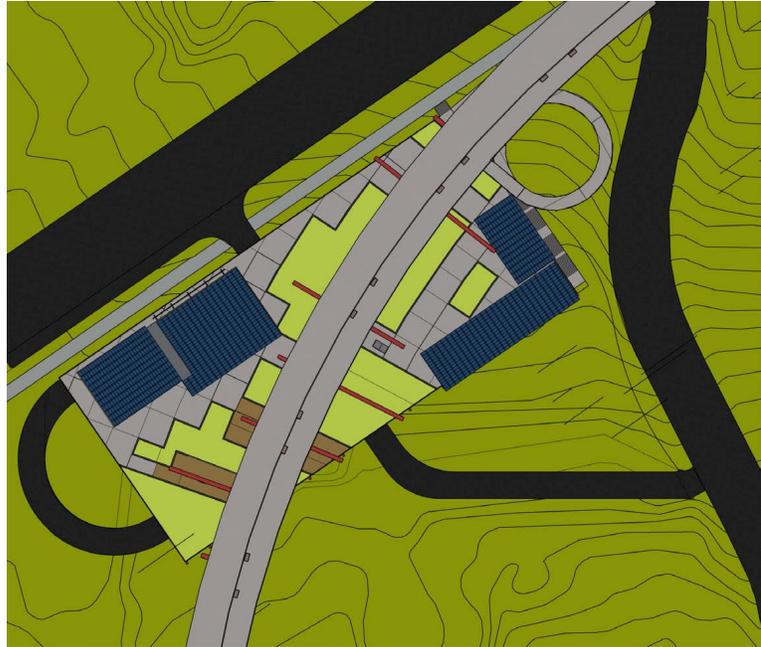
Garage site plan in 20 scale showing key amenities and structures.
